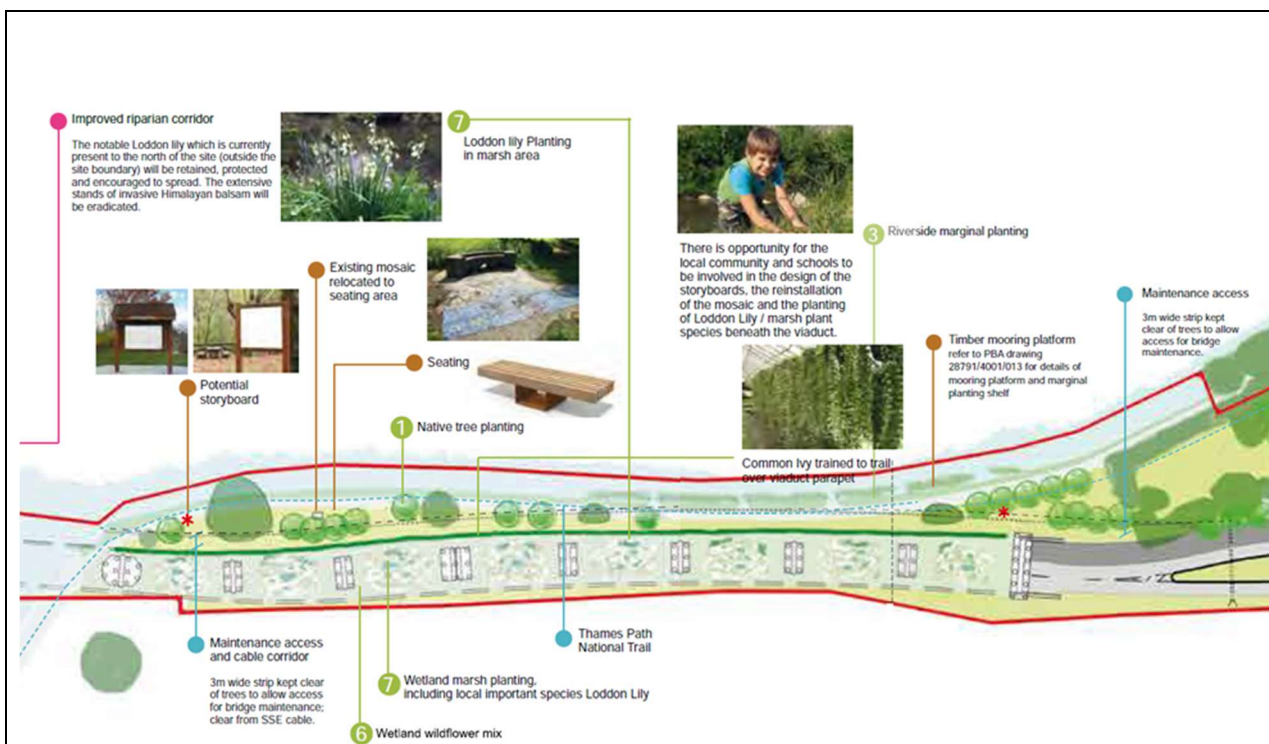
proposed landscaping, public realm improvements, marginal planting and timber pontoons
